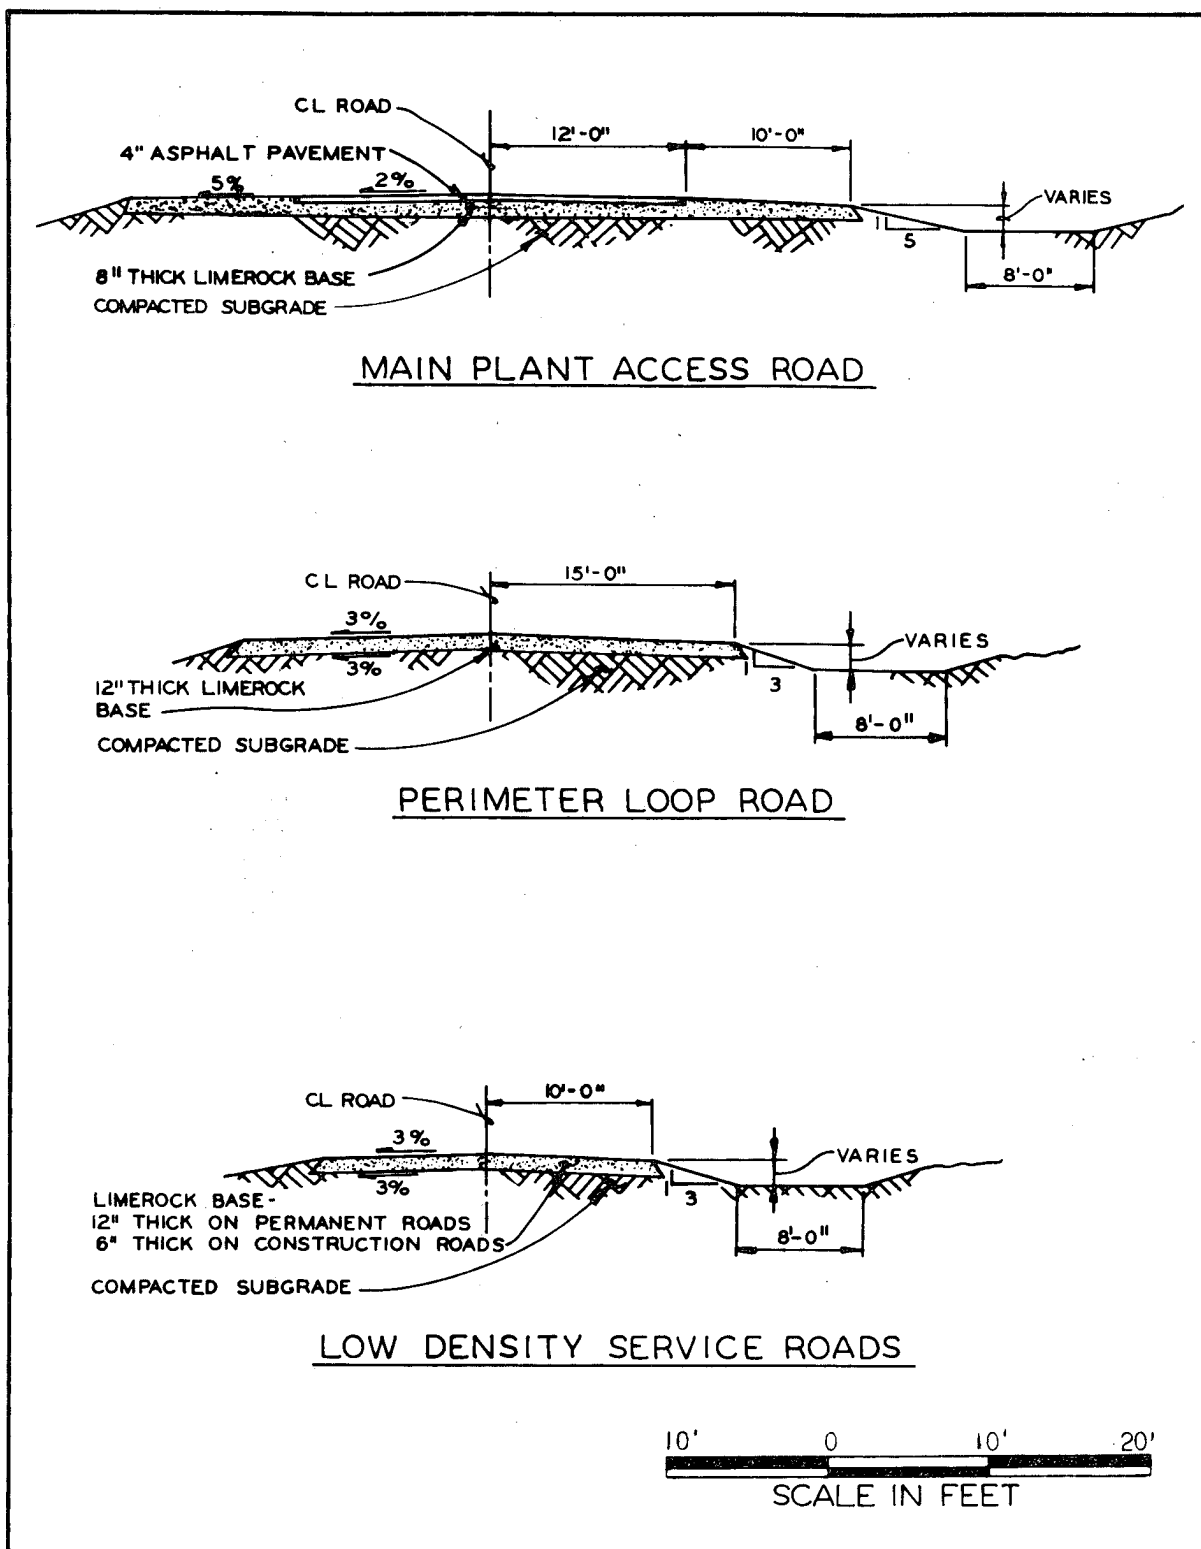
TYPICAL ROAD SECTIONS
